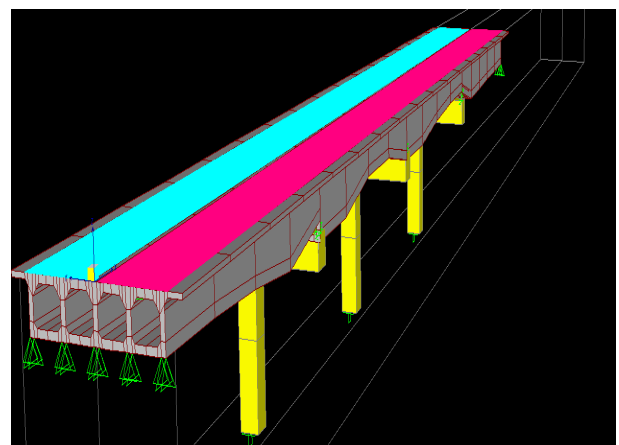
Finite Element model of Rectangular box girder bridge Superstructure created in SAP 2000
